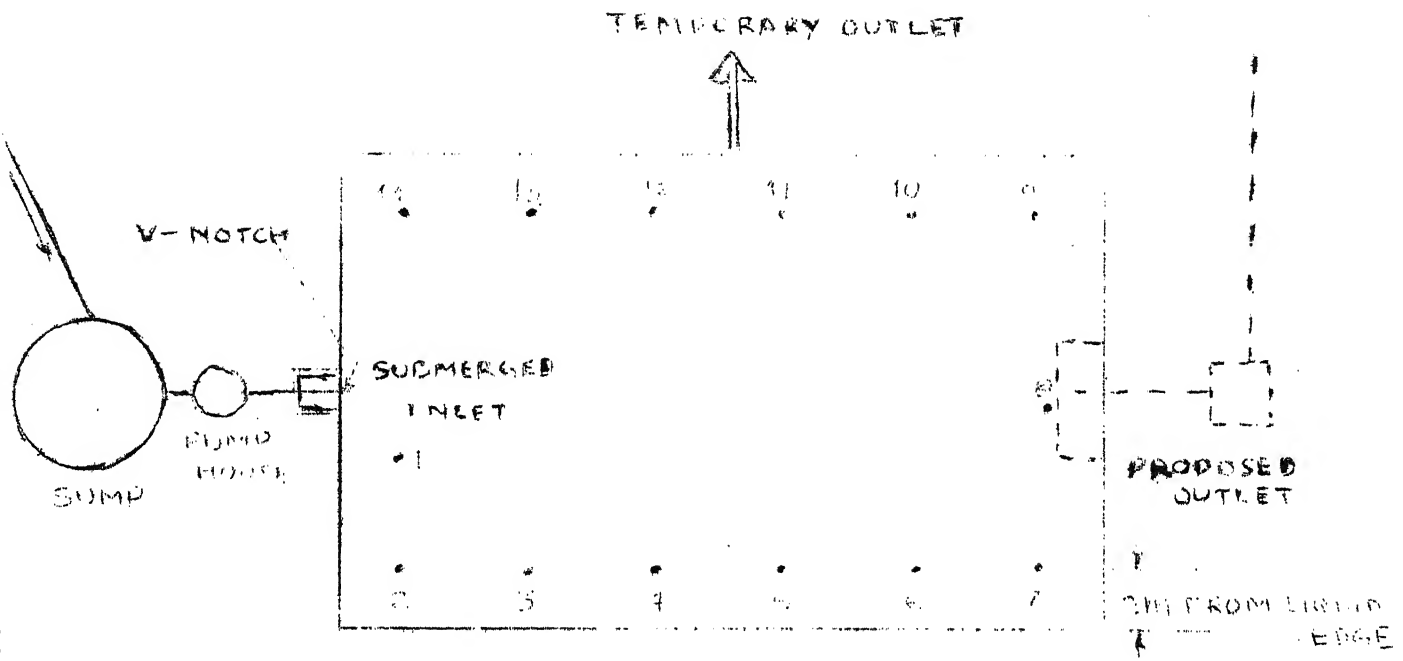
SITE PLAN OF STABILIZATION POND, IIT KANPUR
